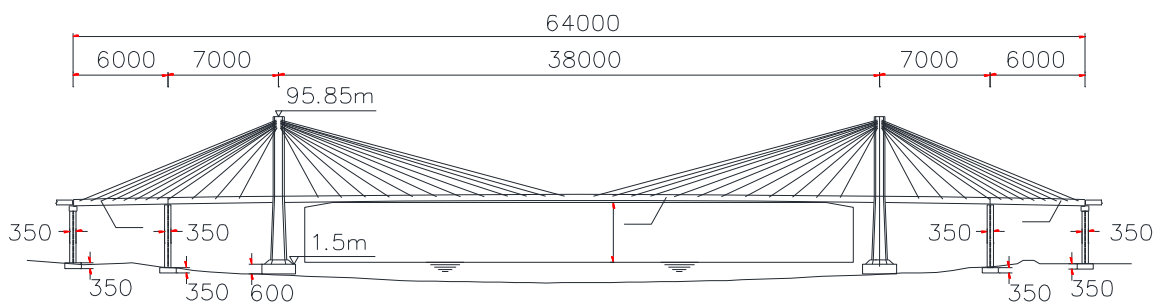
Elevation view of the cable-stayed bridge (unit: cm)
